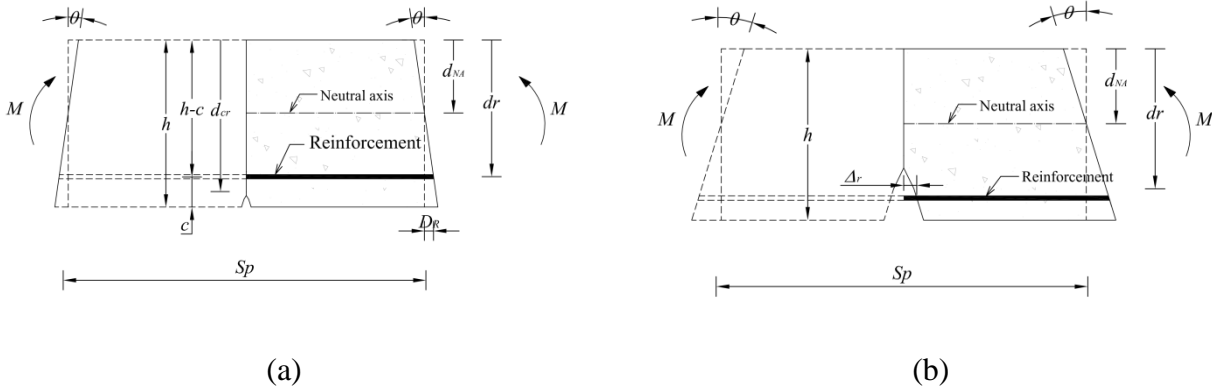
Deformation of reinforcement in flexural concrete member; (a) crack level is lower than reinforcement, (b) crack crossed the reinforcement
